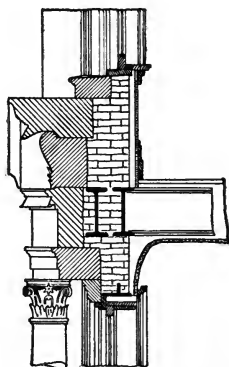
Spandrel Section, Eighteenth Floor. American Surety Co.'s Building, New York.
